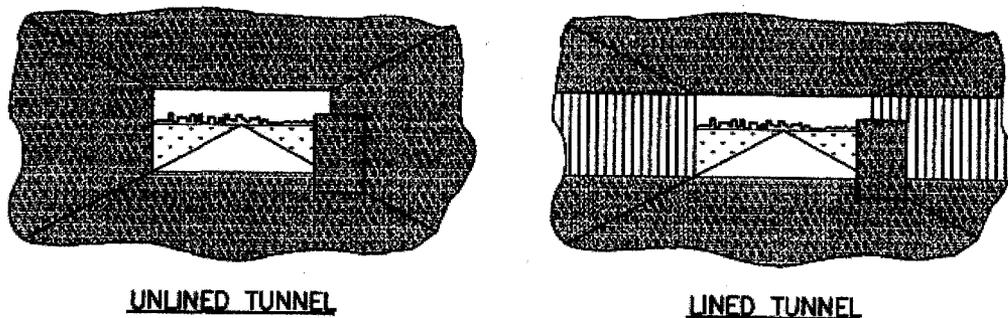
Effect of Natural Light Penetration on Walls at Tunnel Exit (Thompson and Fanslor, '68)
